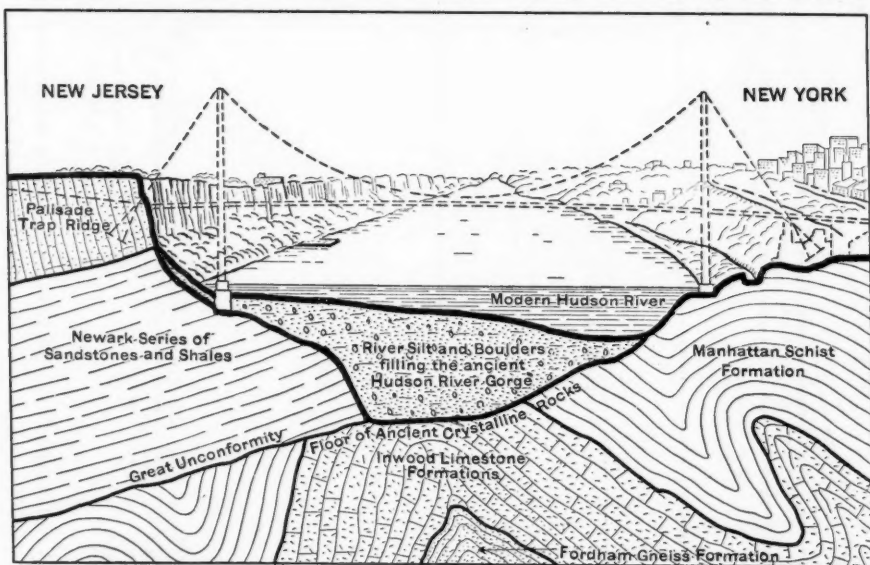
GEOLOGICAL CROSS-SECTION AT SITE OF GEORGE WASHINGTON BRIDGE.
